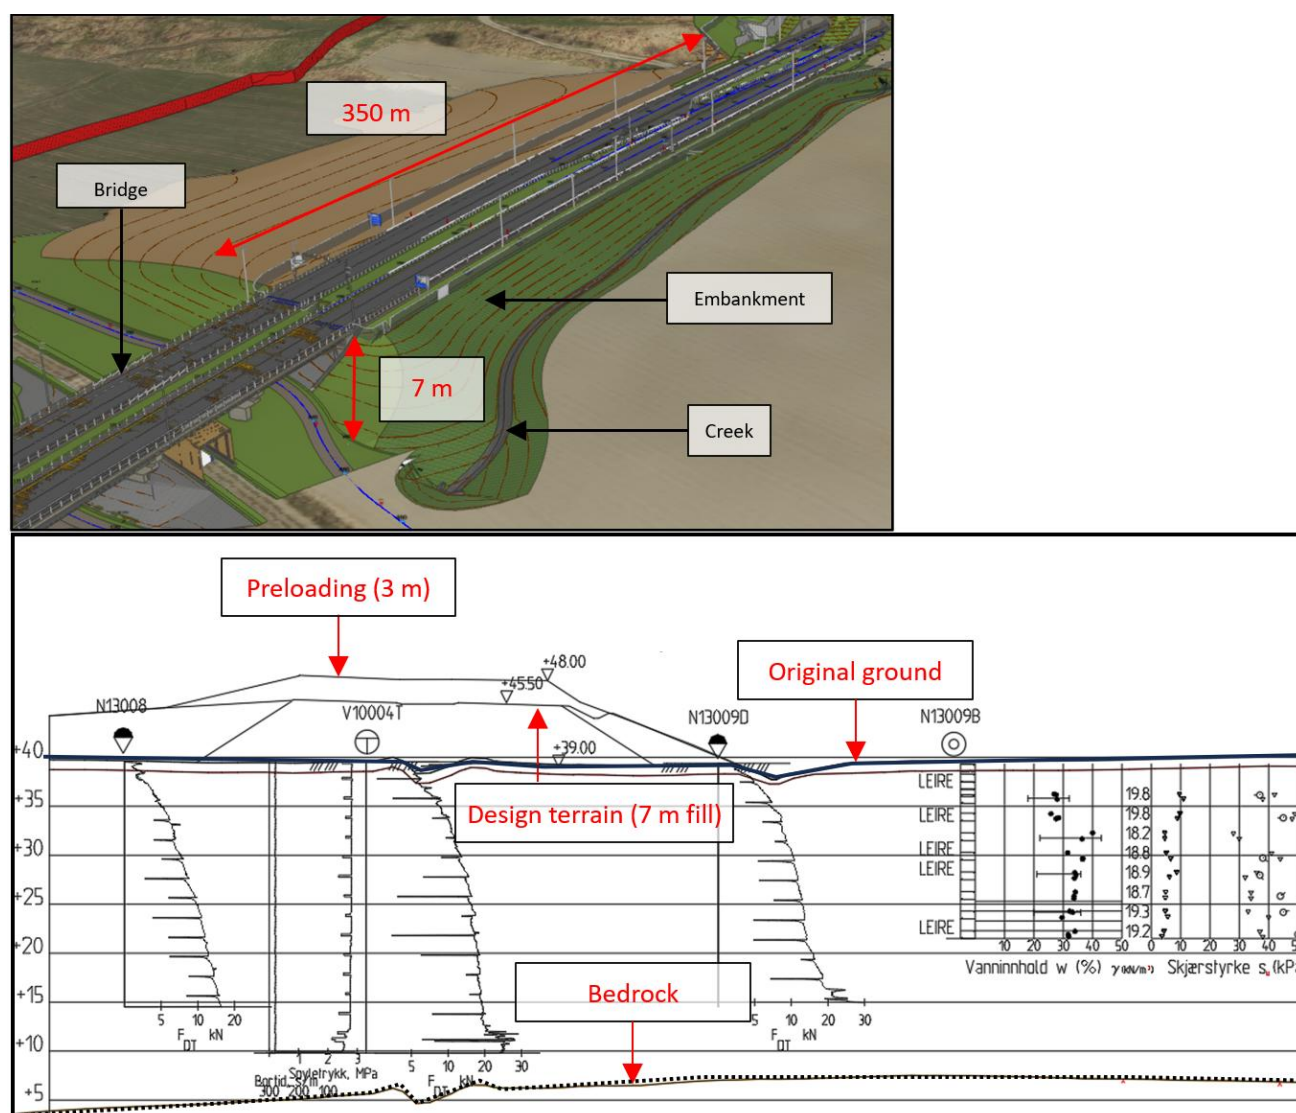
Top: Designed 3D model of the bridge and the embankment at Holan. Bottom: Cross-section with soil profile, permanent terrain, and preloading.
